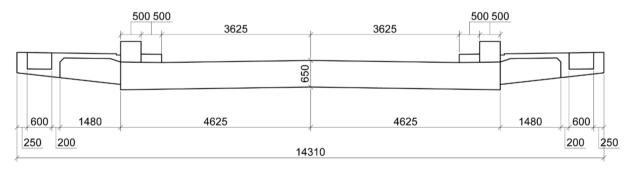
Cross-sectional view of the Nieuwklap Bridge. Units: mm.
